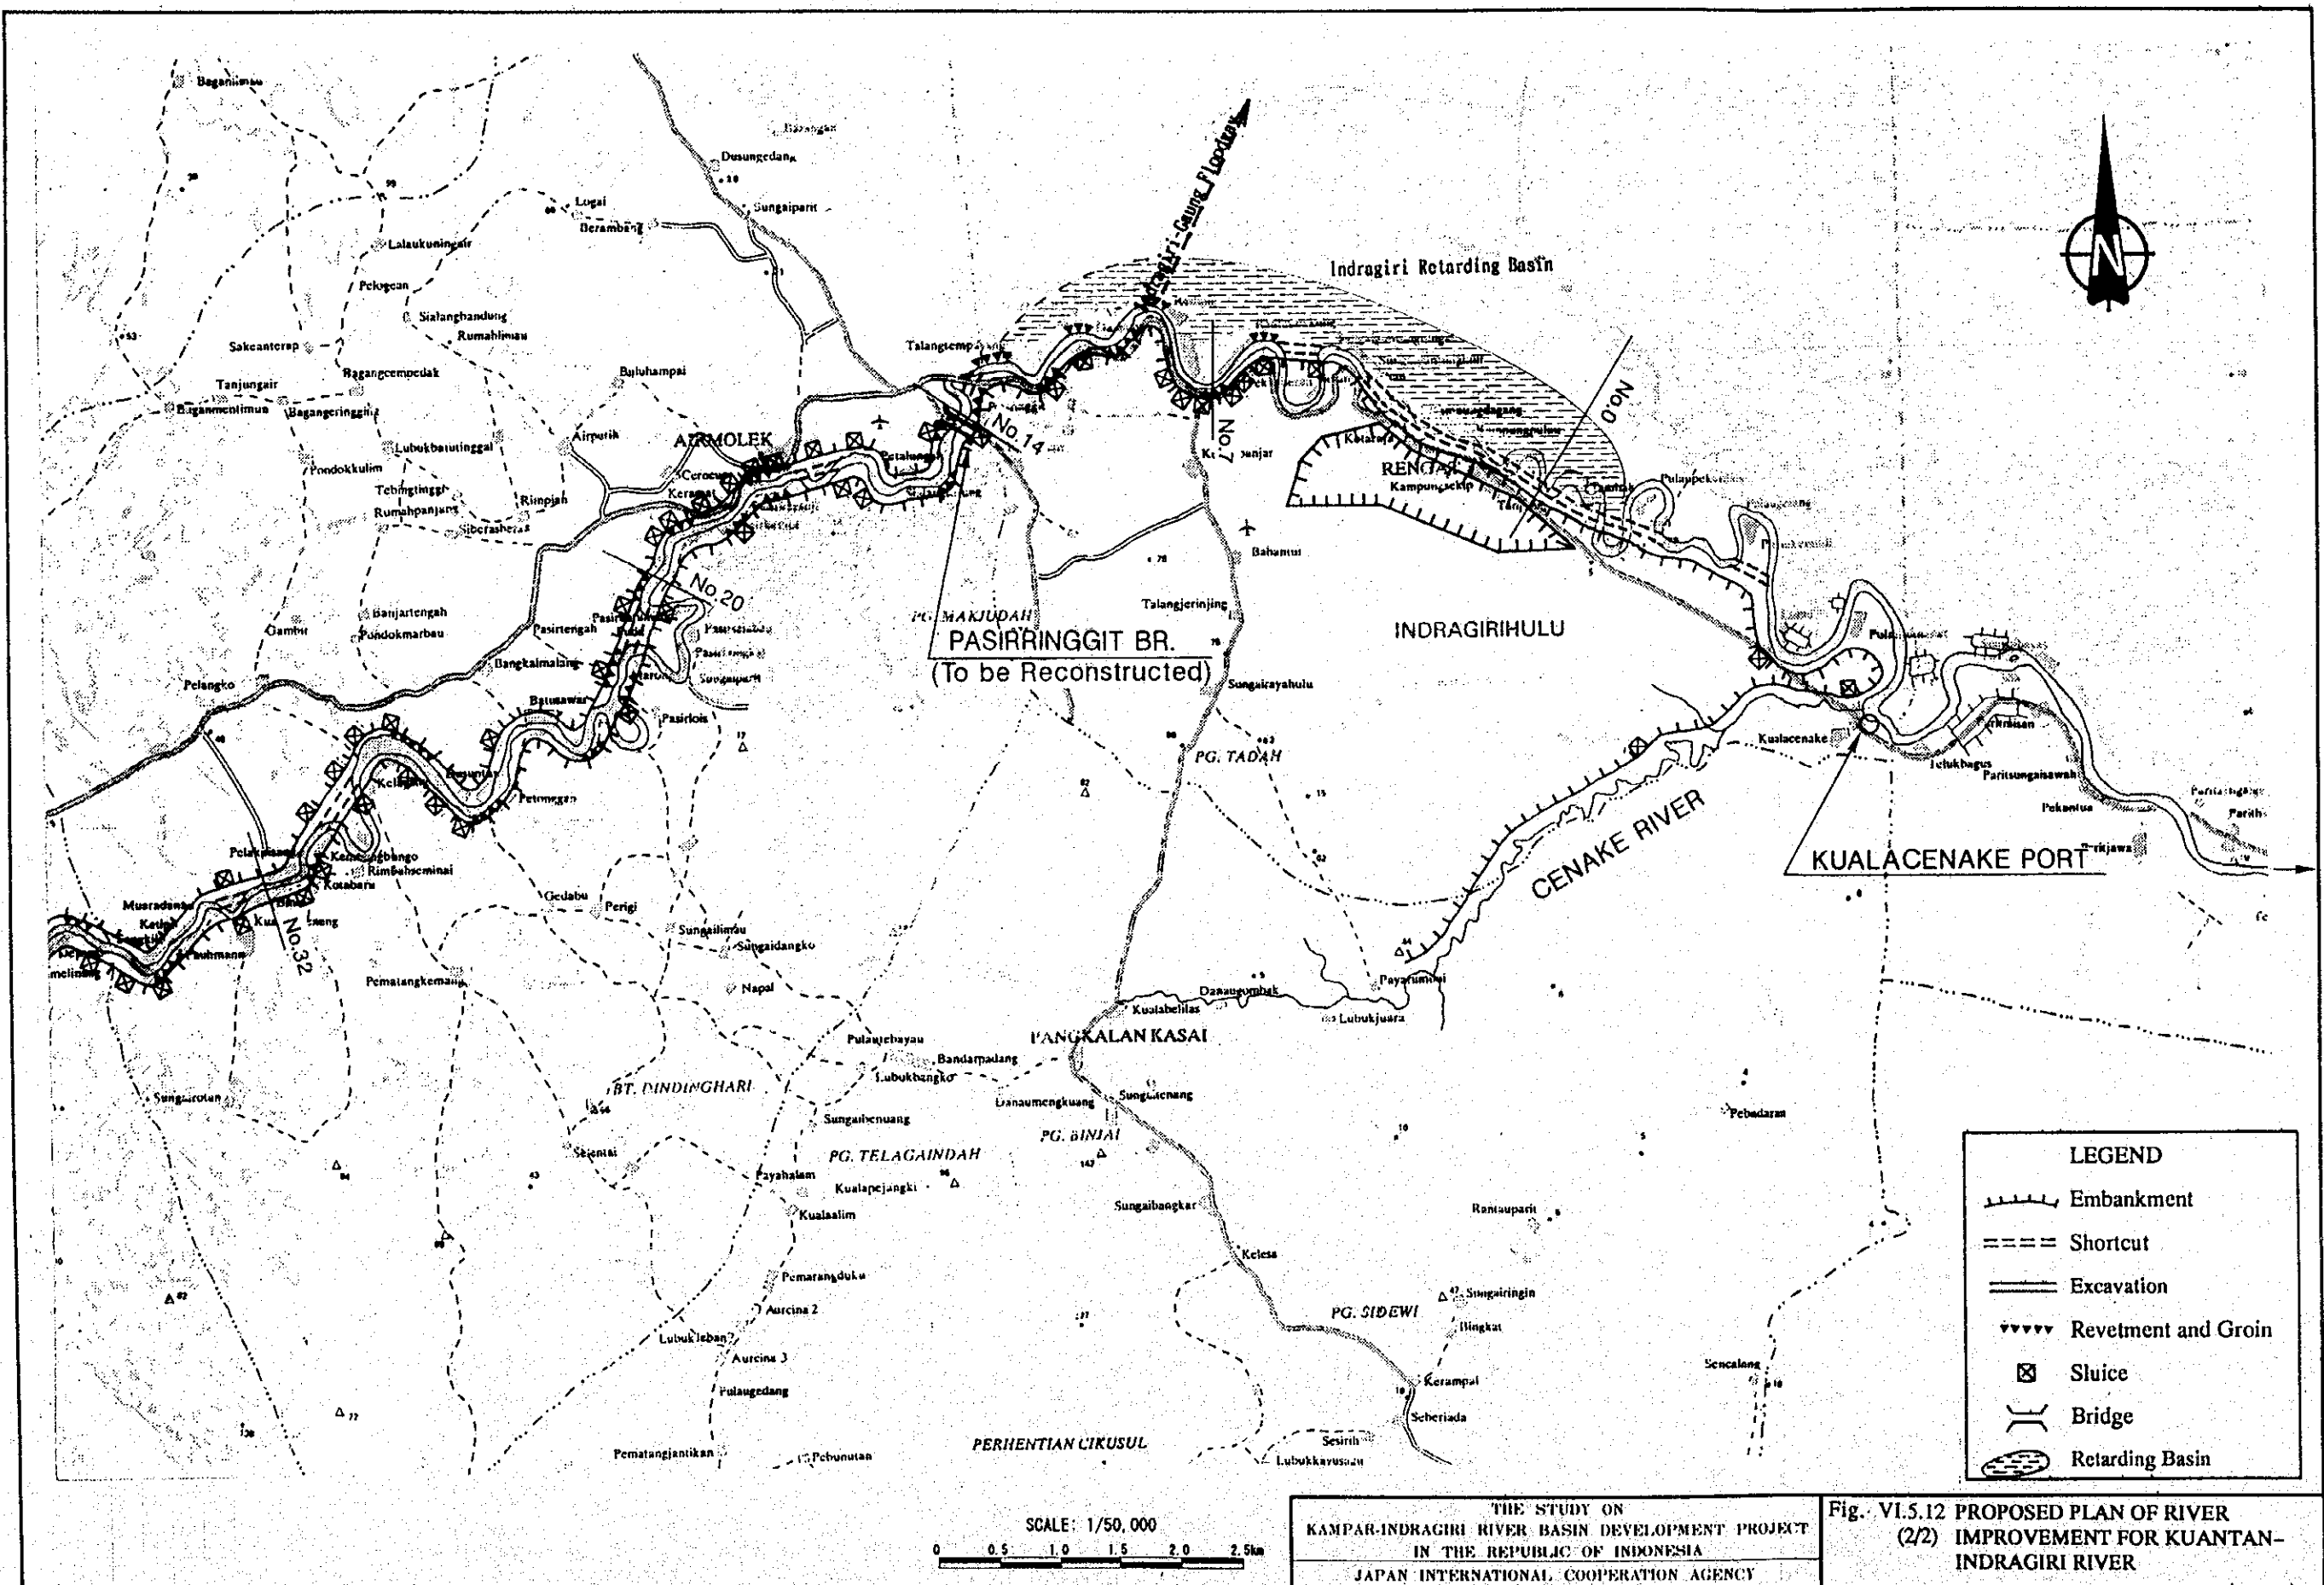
PROPOSED PLAN OF RIVER IMPROVEMENT FOR KUANTAN-INDRAGIRI RIVER
